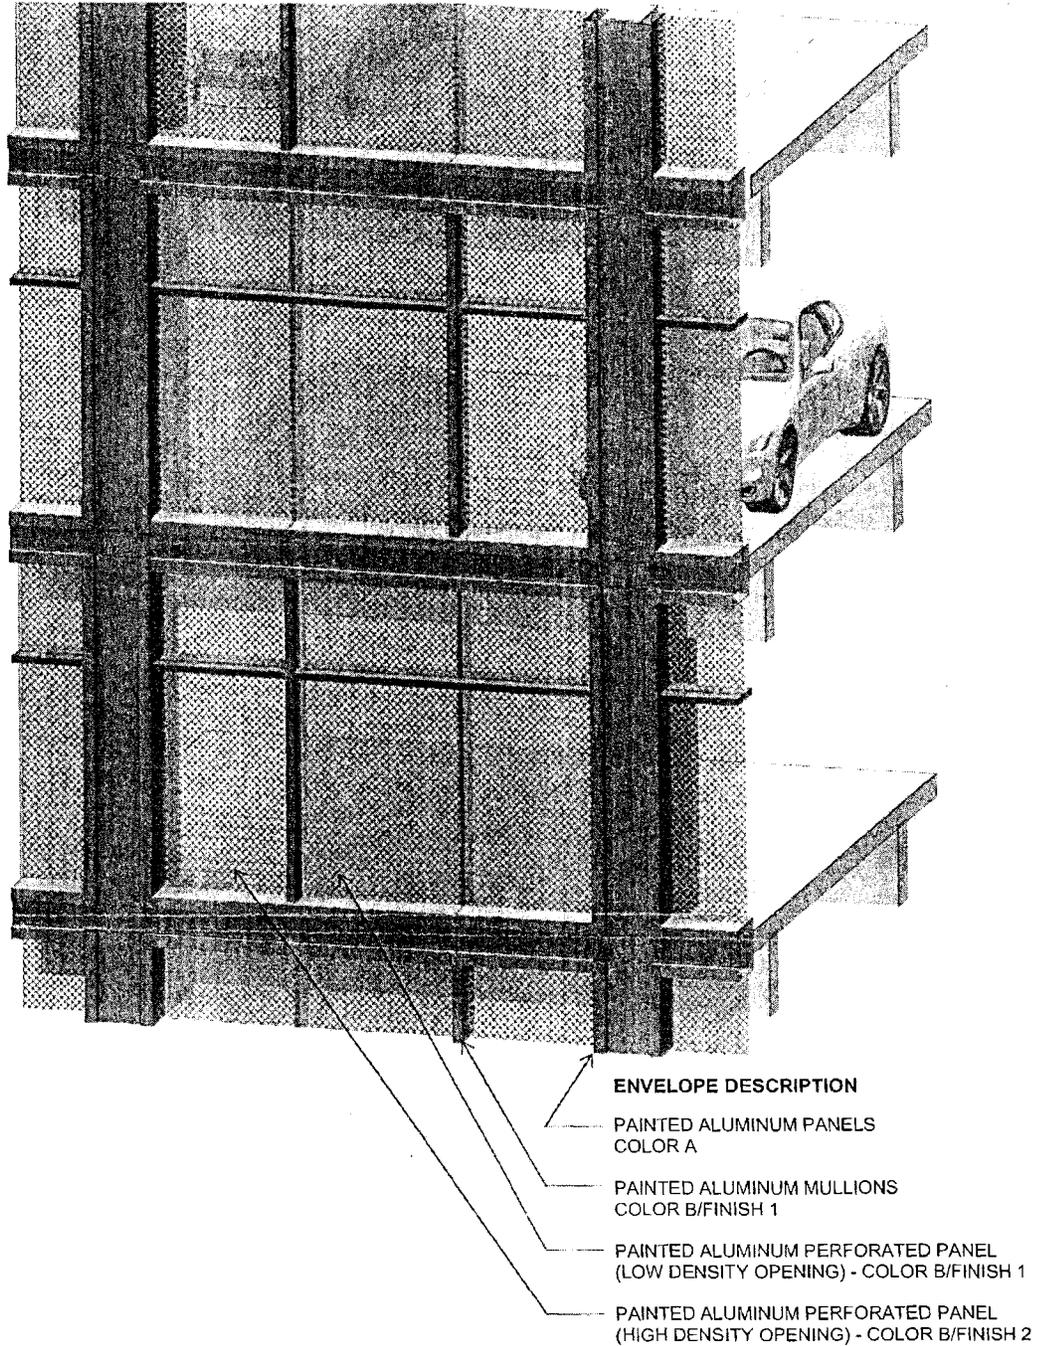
C: TYPICAL BAY @ GARAGE-DETAIL
